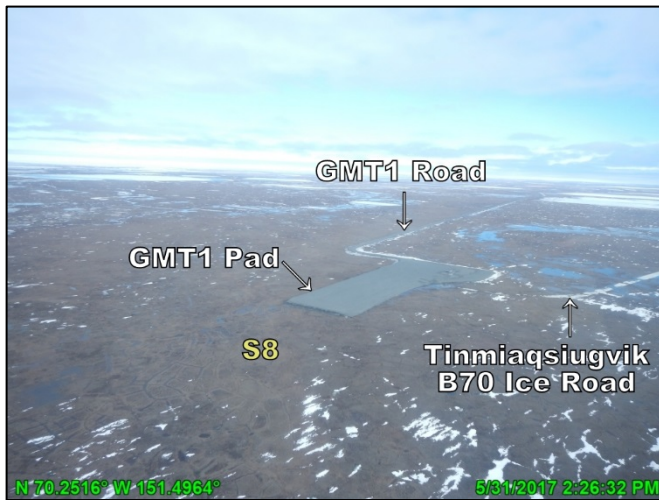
Local melt at gage S8 and GMT1 pad, looking northeast; May 31, 2017
